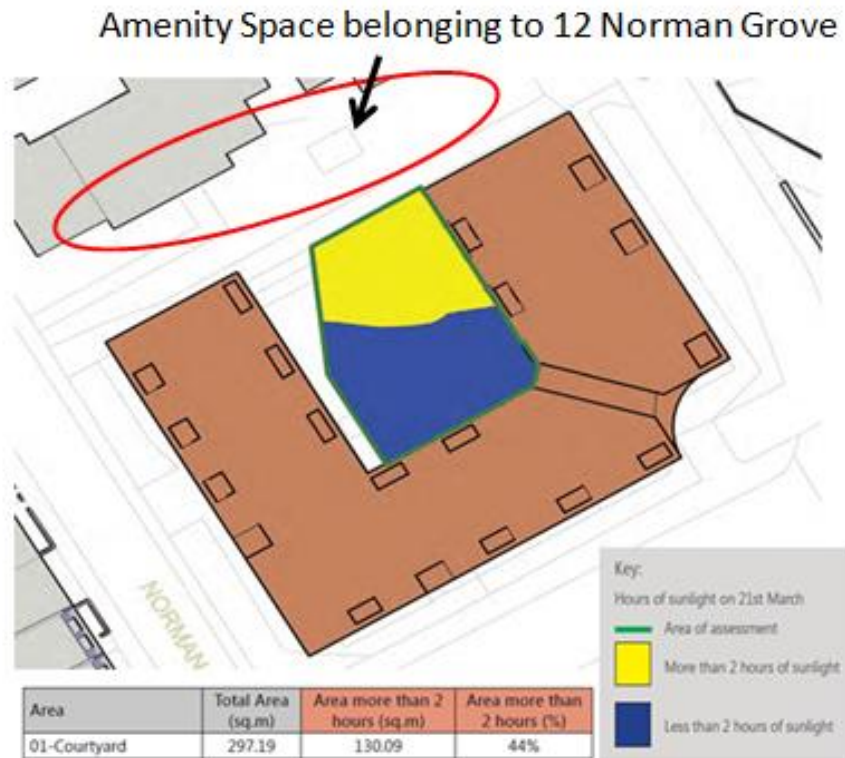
Plan showing location of amenity space at 12 Norman Grove.
